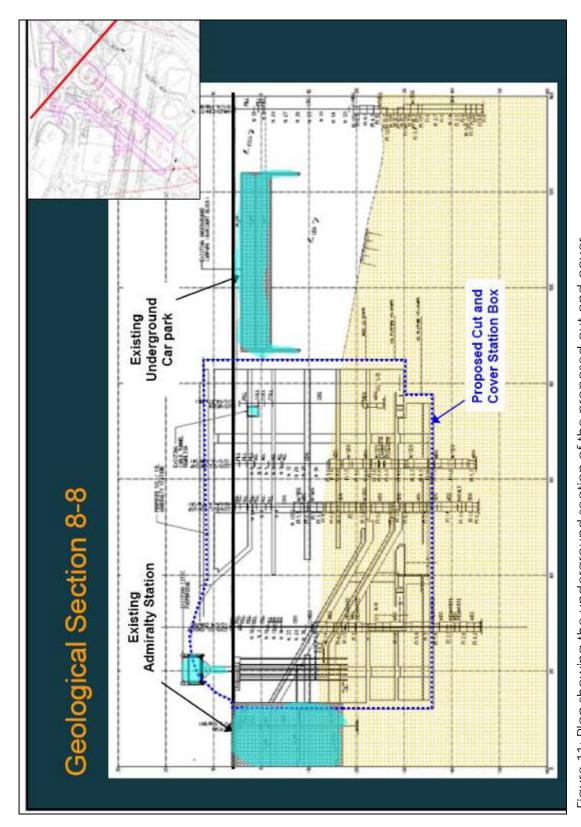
Plan showing the underground section of the proposed cut-and-cover station box in Harcourt Garden (Arup 2009)
